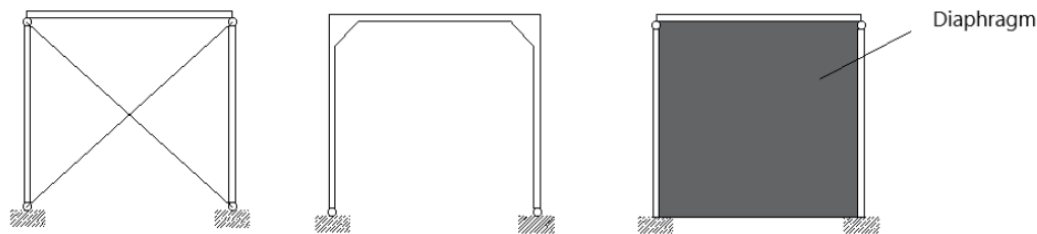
Left figure: Truss action, Middle figure: Frame action, Right figure: Diaphragm action
